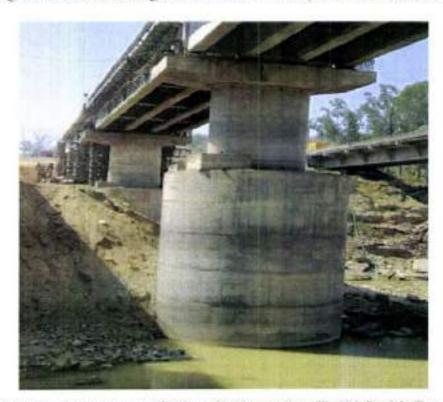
Excessive scouring around footing of bridge on river Chakki, Punjab (Ramesh, 2012)
